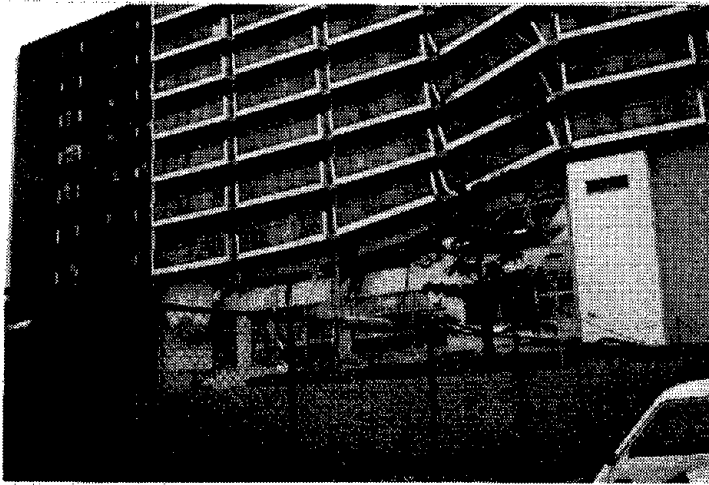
East elevation of collapsed building showing mid-height collapse
